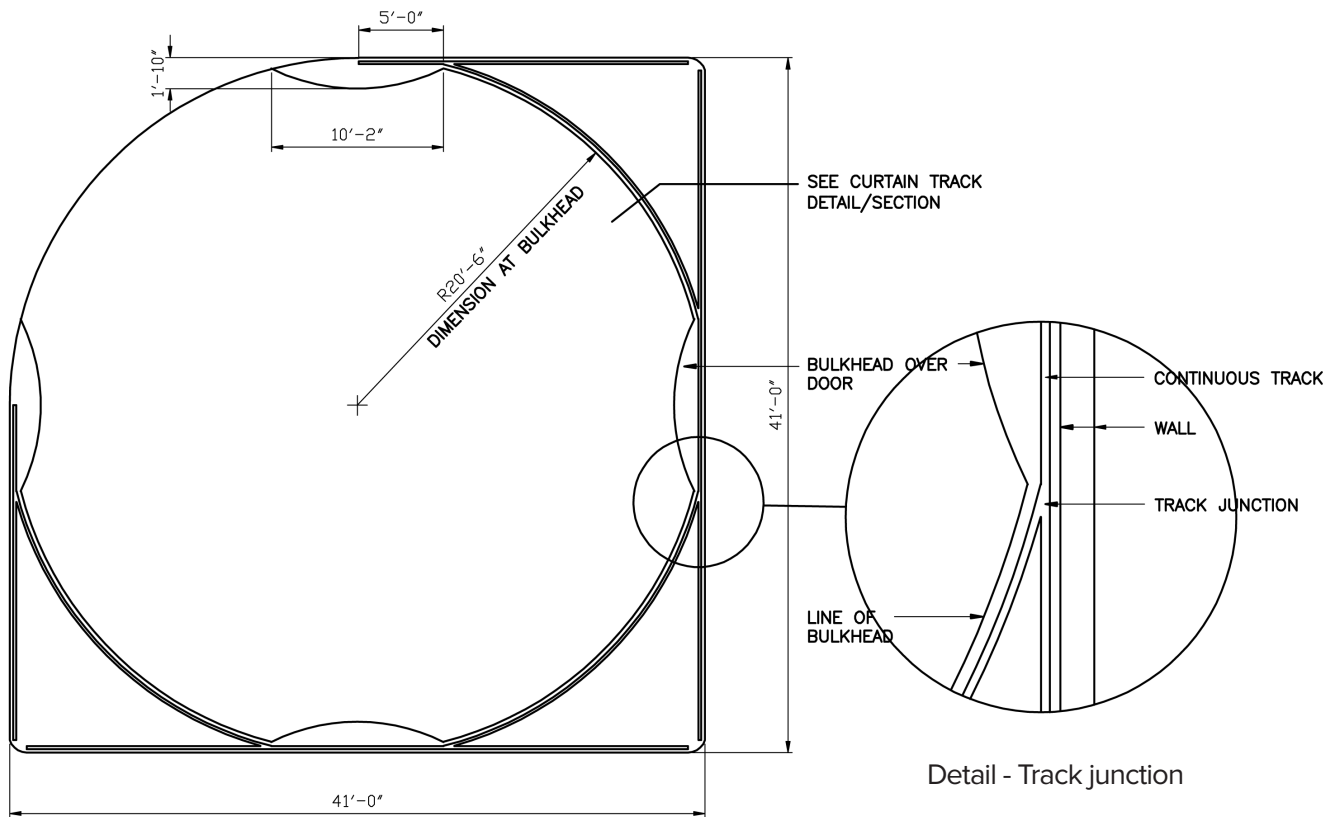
Reflected Ceiling Plan Curtain Track. Not to scale.
